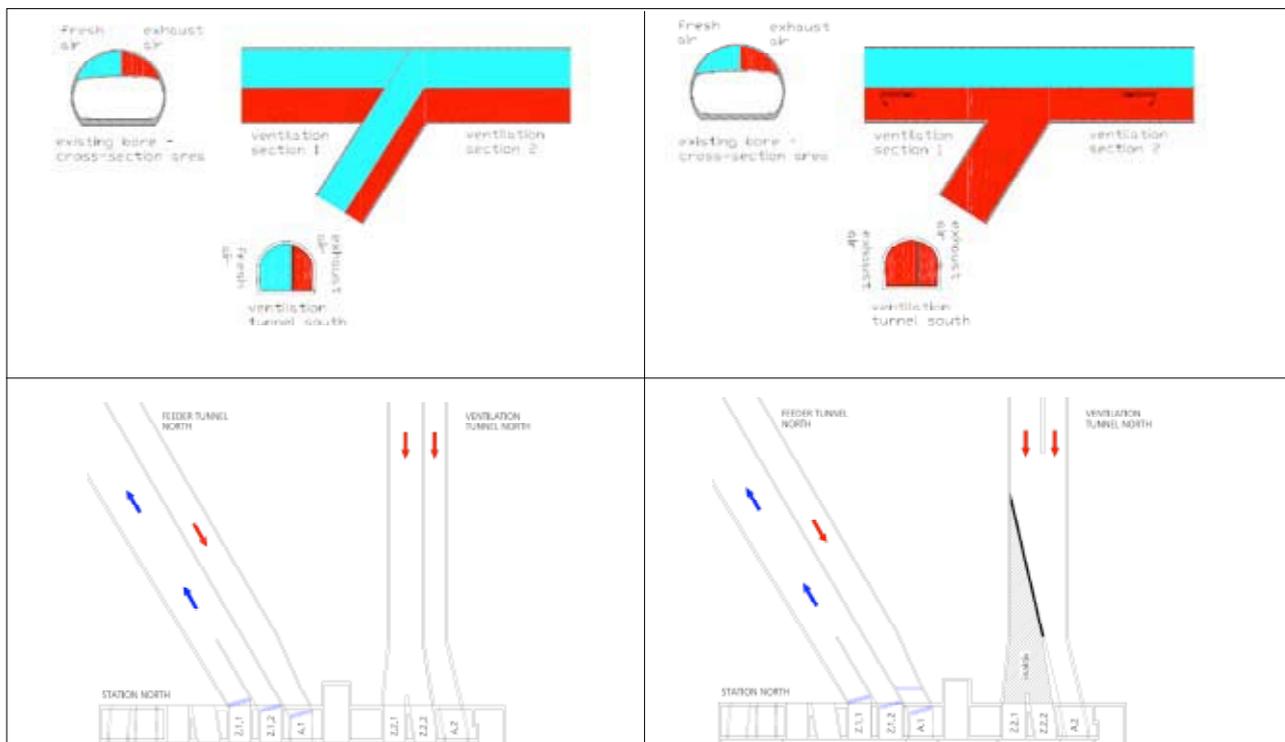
Sketch of the structural alteration works in ventilation section 1 and 2
